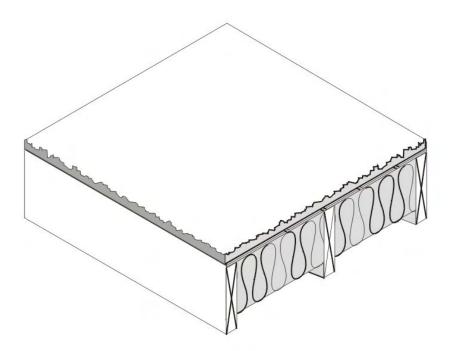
Wood Framed Floor with a Crawl Space
